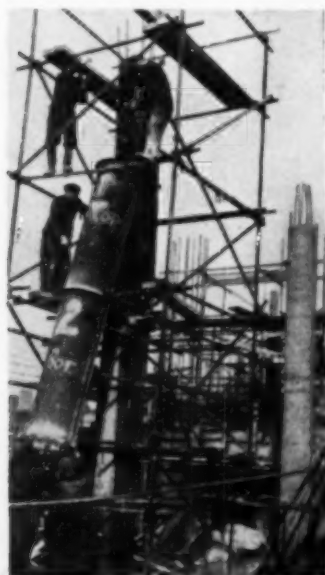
Construction of 24-in. Columns for Omnibus Station.
